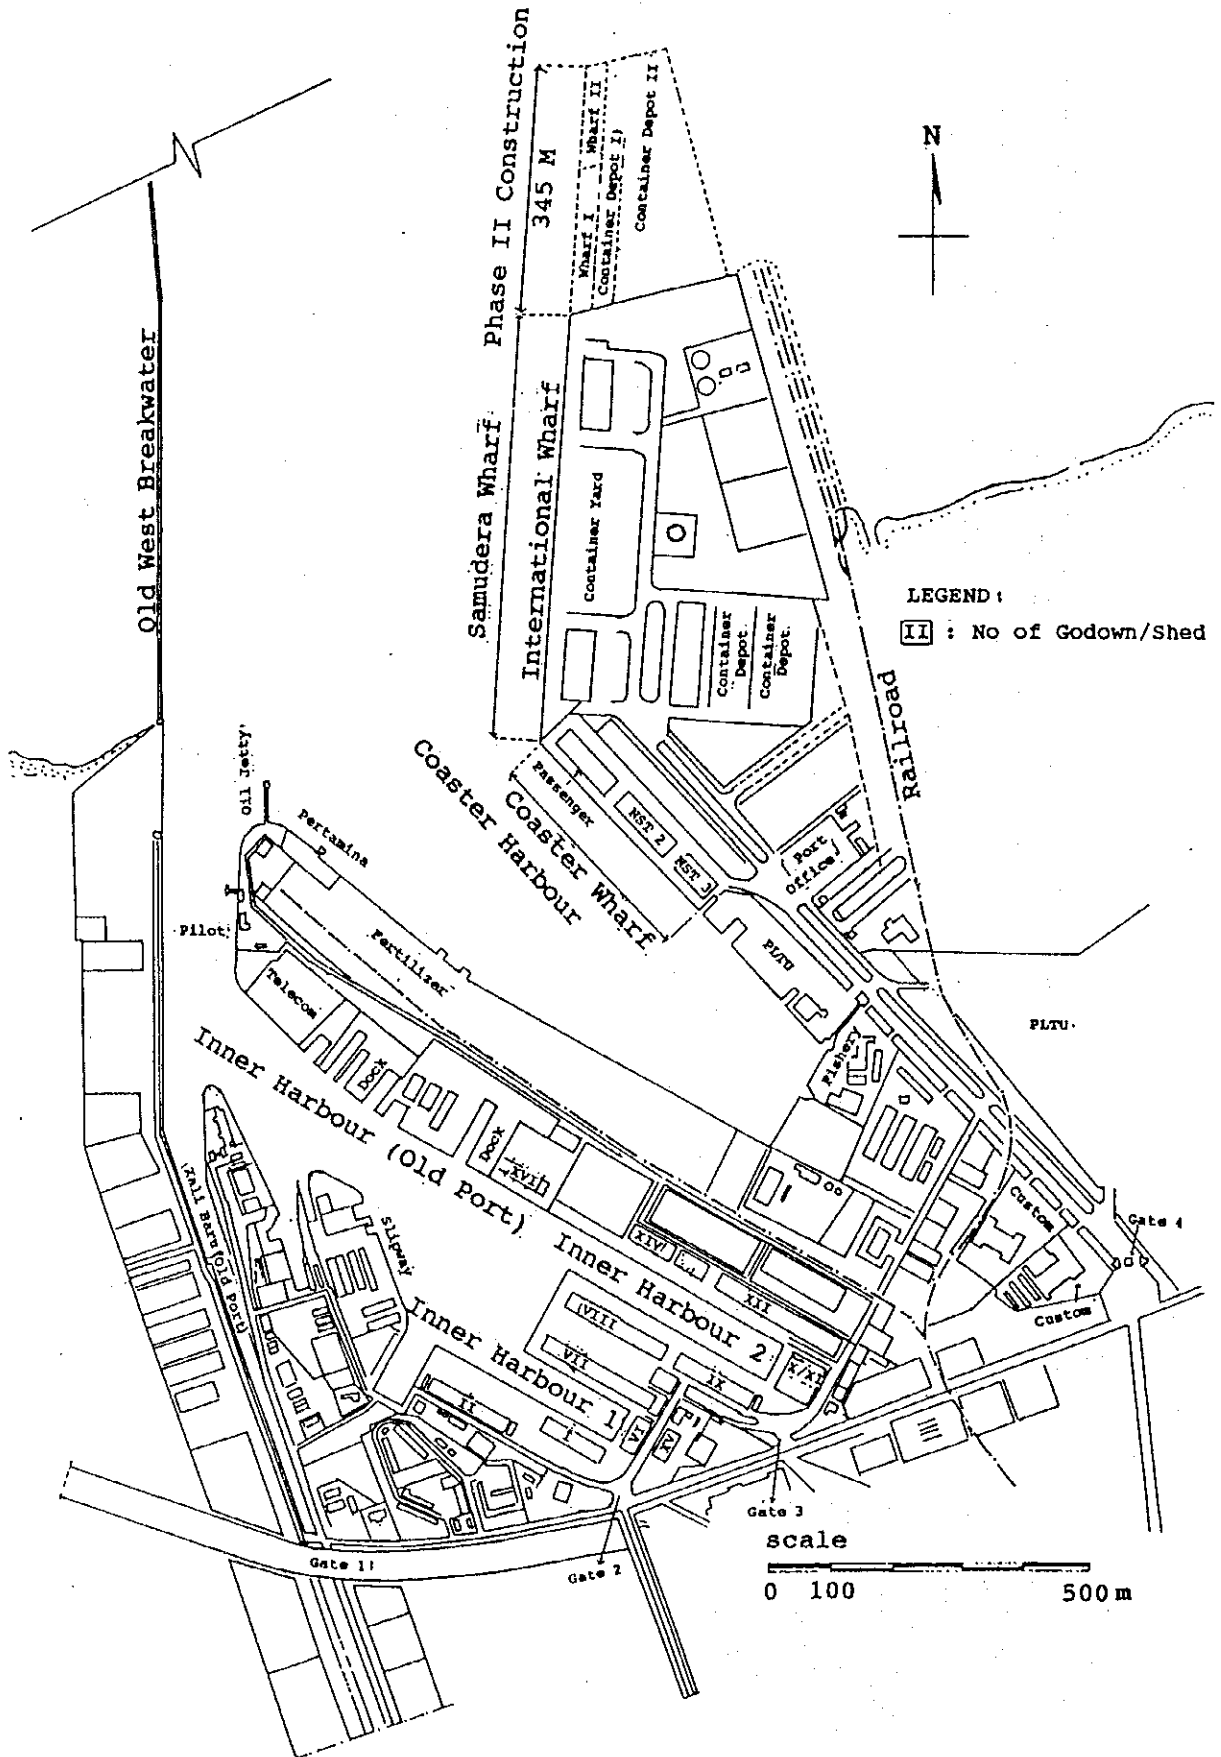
General Layout Plan of Port of Tanjung Emas, Semarang
